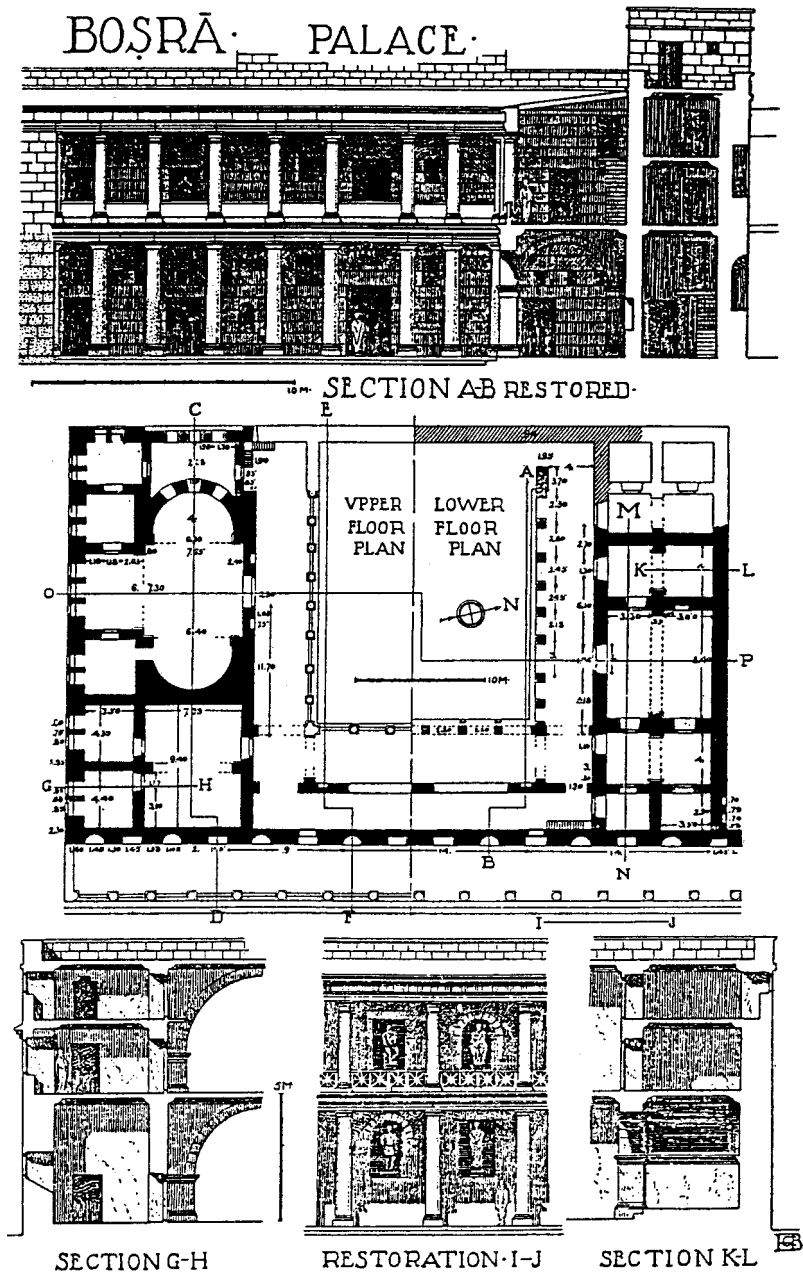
Bostra. Plan and elevation of the 'Palace'. After Ellis (2000).
